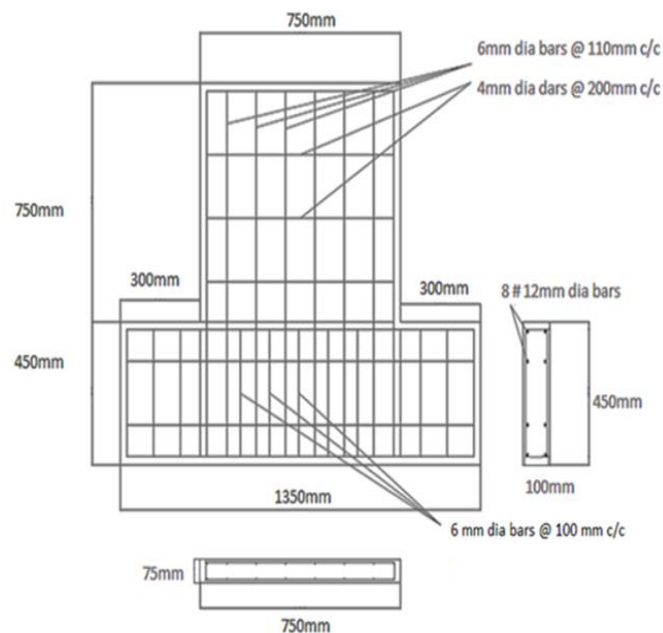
Dimensions and Reinforcement details of Shear wall specimens NC and UC
